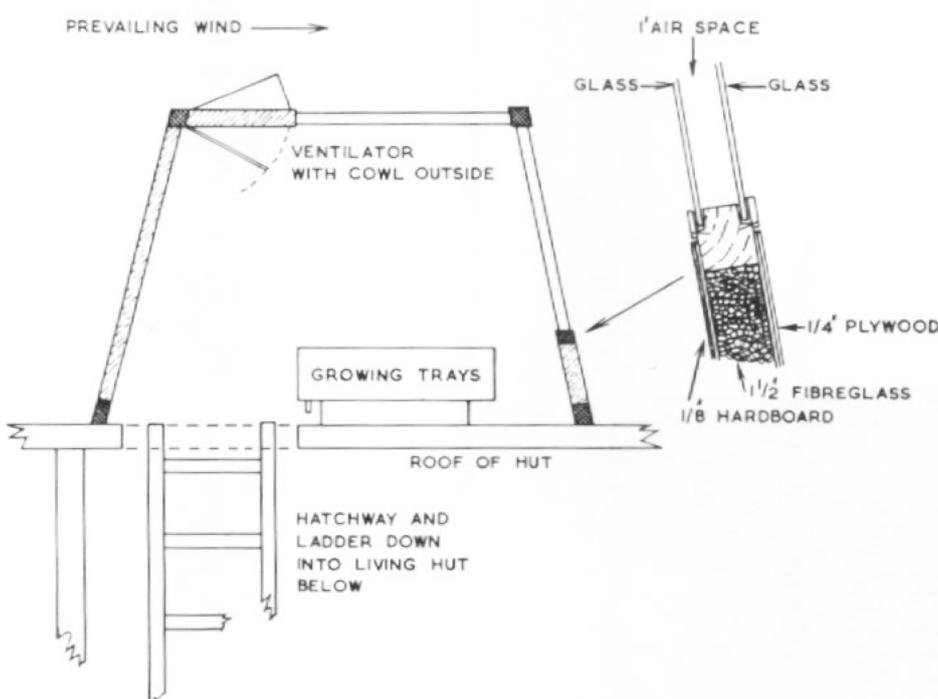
Construction detail of the outside greenhouse at Halley I. Photo attributed to Jack Hill. Source: <https://core.ac.uk/download/pdf/31017763.pdf>
